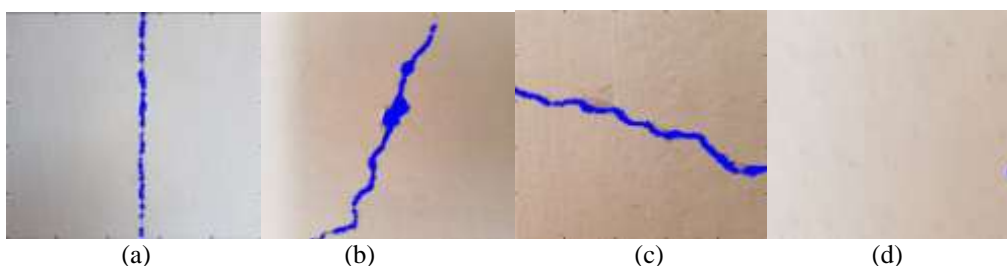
A vertical crack (a) and a diagonal crack (b), (c) and a surface with no crack (d) are recognized on a real concrete structure.
